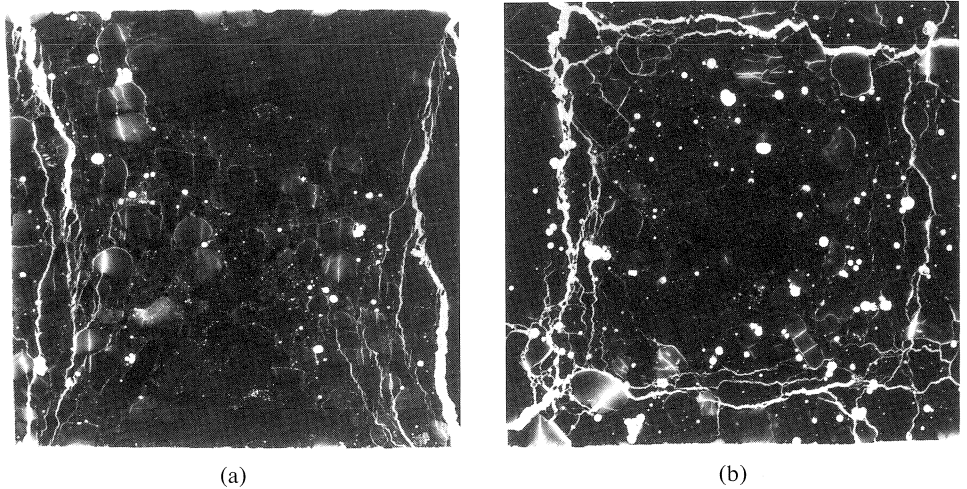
Internal crack patterns for tests with dry platens: (a) vertical plane, (b) horizontal plane.
